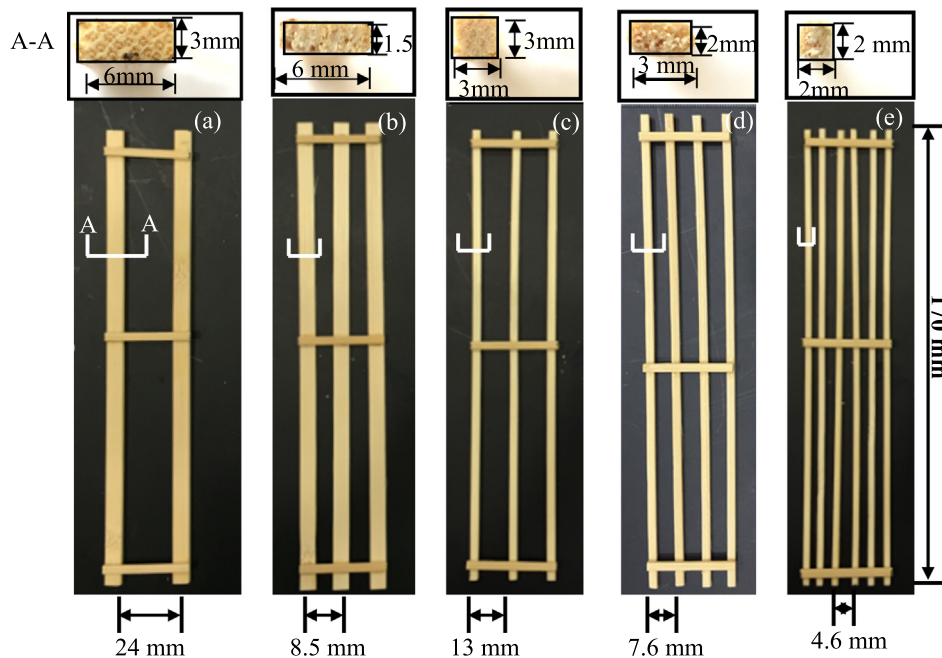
Different arrangement with various cross-section sizes and numbers of bamboo strips: a) BA-1, two bamboo strips with cross section dimension of 3 mm × 6 mm (H × W); b) BA-2, three bamboo strips with cross section dimension of 1.5 mm × 6 mm (H × W); c) BA-3, three bamboo strips with cross section dimension of 3 mm × 3 mm (H × W); d) BA-4, four bamboo strips with cross section dimension of 2 mm × 3 mm (H × W); e) BA-5, six bamboo strips with cross section dimension of 2 mm × 2 mm (H × W). The length of each bamboo strip was 170 mm.
